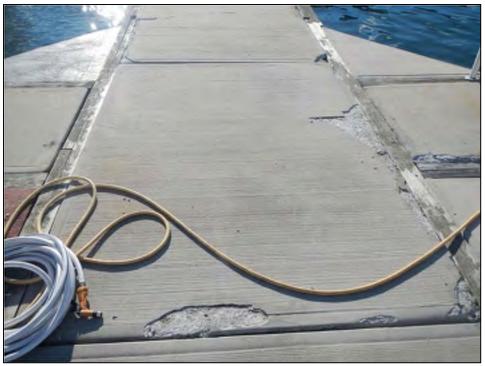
Deterioration of the edges of the concrete deck panels creating trip hazards.
